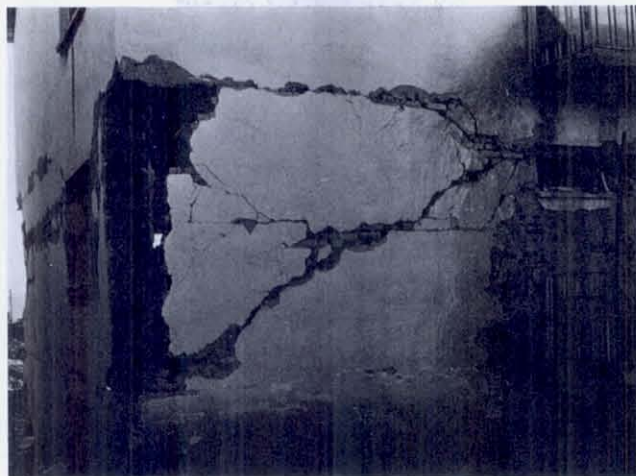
A view of the southwest corner, south wall in the foreground. Once the corner has fallen, a single diagonal crack meeting a horizontal crack on the bottom of the collar beam is enough for a large segment of wall to be lost. The collapse of the corner, the large diagonal crack, and the distortion of the frames of the small windows indicate that the second story shifted left relative to the first.
